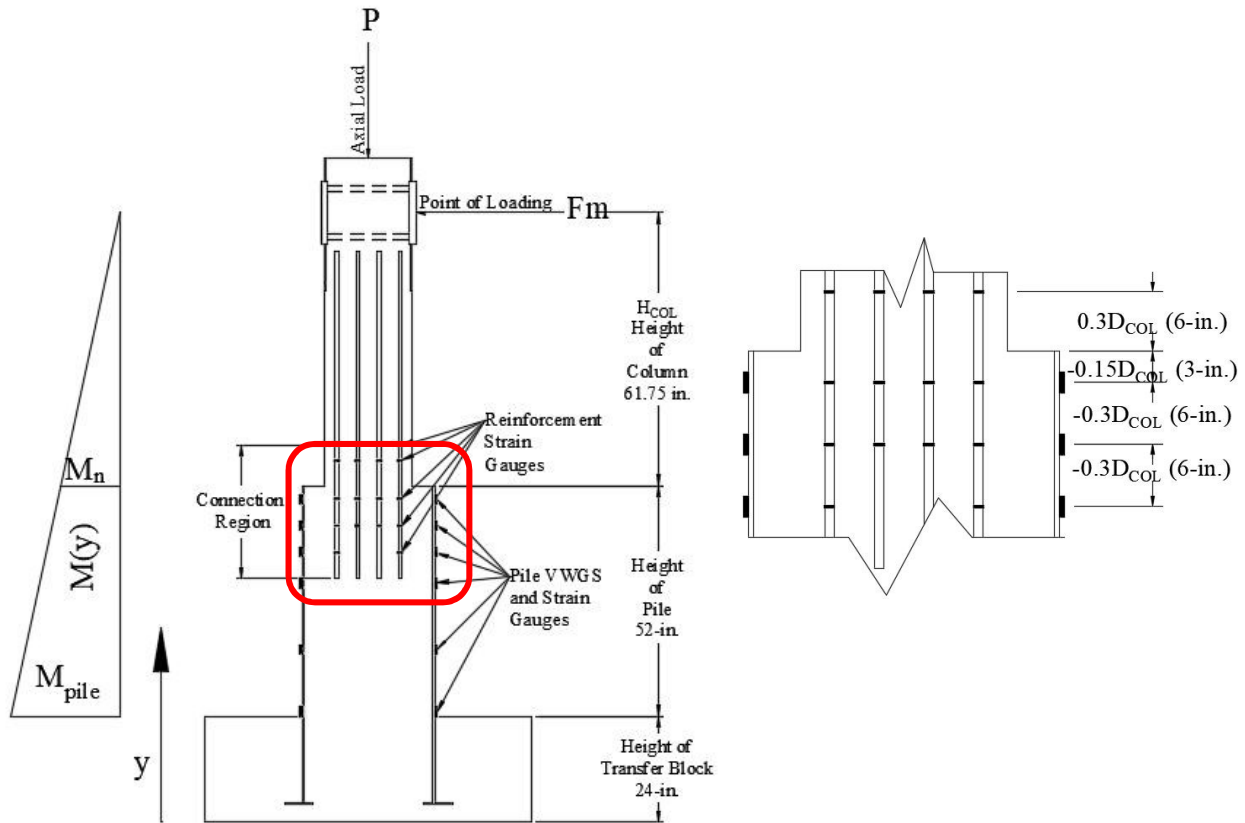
a) Cross-Section of Specimen Elevation with Gauge Locations Highlighted
